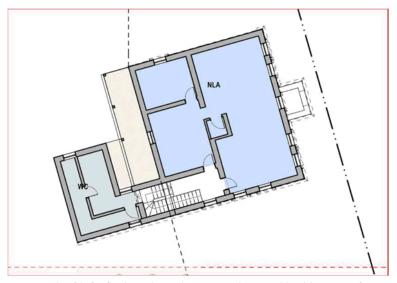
Plan of the first floor layout showing the reconstructed rear verandah and the provision of WC facilities in the non-significant rear addition. Some minor internal walls have been removed to facilitate open working areas – it is intended that nibs and bulkheads be retained to conserve the legibility of the original layout. Source: FJMT Studio
